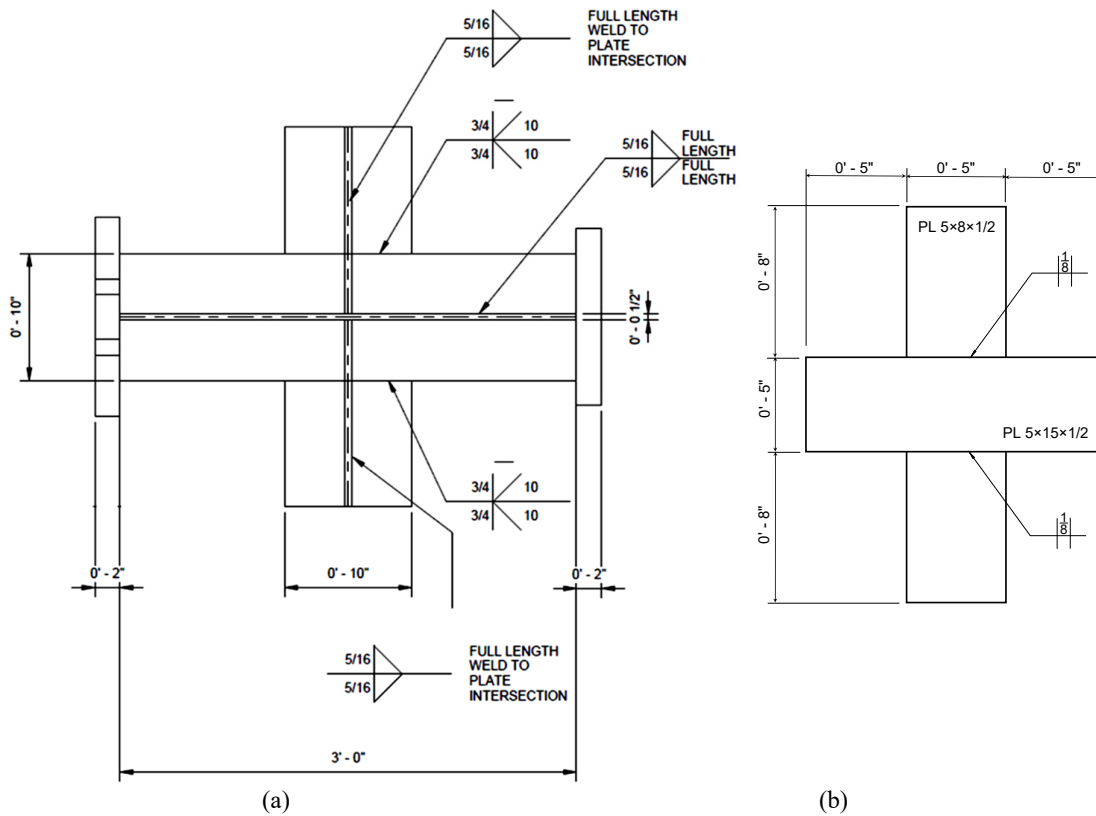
Gate section F13 fabrication details for (a) full-scale specimen and (b) half-scale specimen
